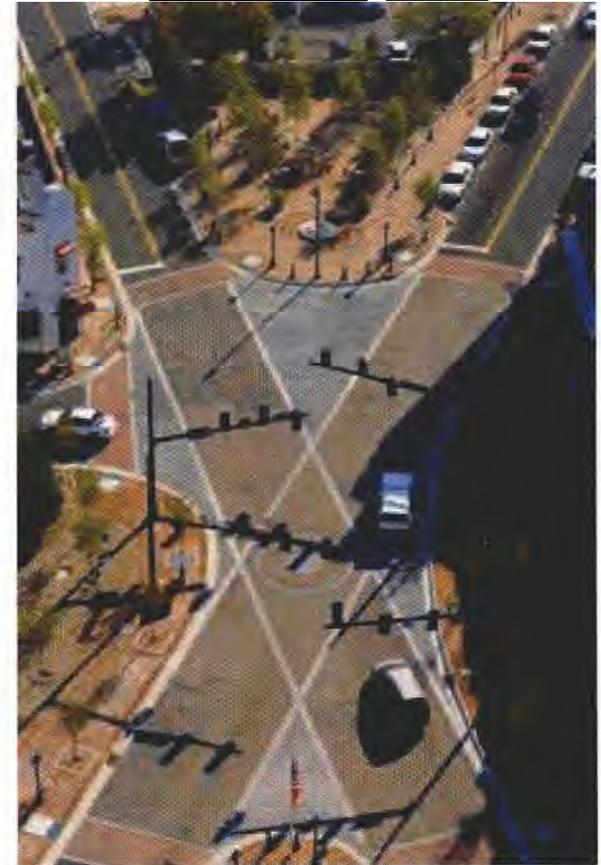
Sample Intersection Image: A downtown streetscape combining standard paving and decorative pavements. (Photo by Cameron Davidson for Kimley-Horn and Associates, Inc.)
